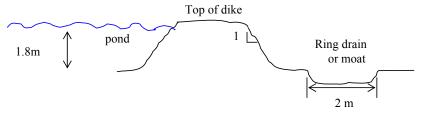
Cross section of ring drains in each pond (not to scale) (Source Figure 3, Environmental Management Plan. Appendix 3)
